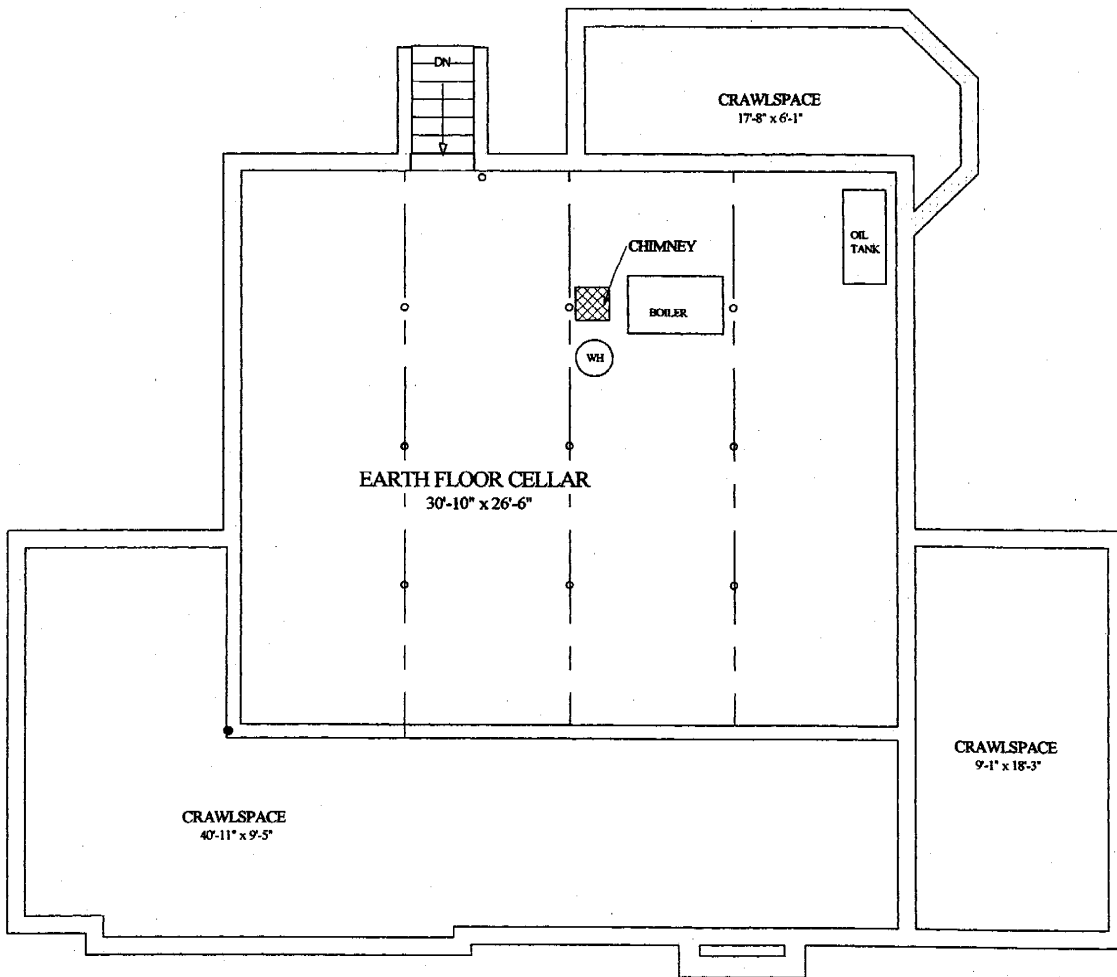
Current cellar/foundation plan. The original crawlspace has been excavated to create a dirt-floored cellar. The shaded crawlspaces are all additions. Drawing by Dean Brenneman & Jason Gagen, copyright 2004 by Brenneman & Pagenstecher, Inc.
